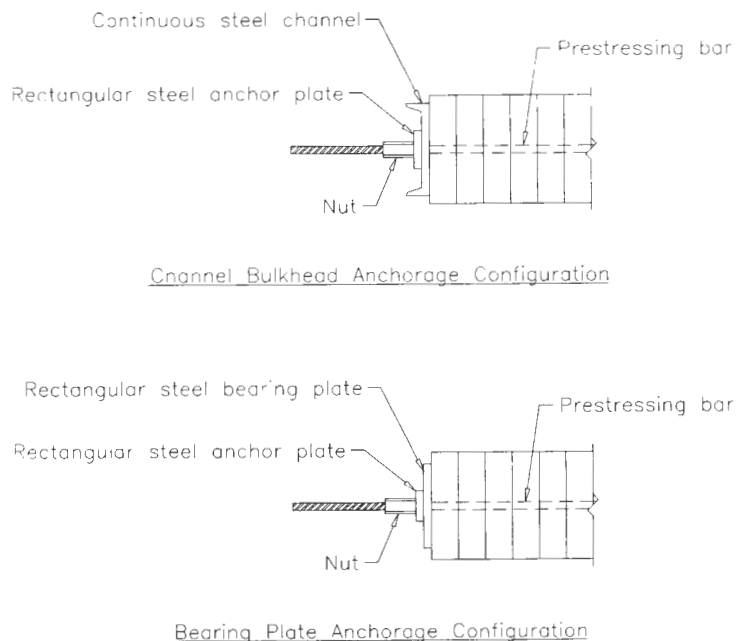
Stressing bar anchorage configurations commonly used on stress-laminated bridge decks.
